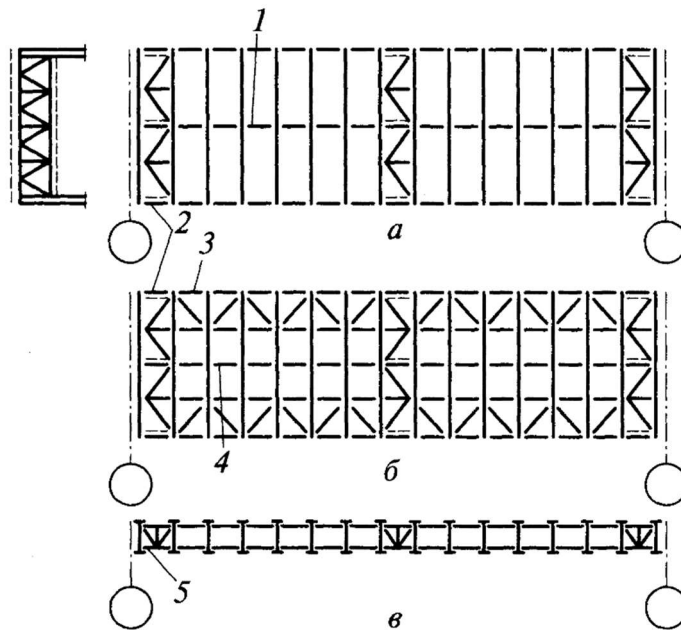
Horizontal bracing installation options (Kudishin Y. 2006)
